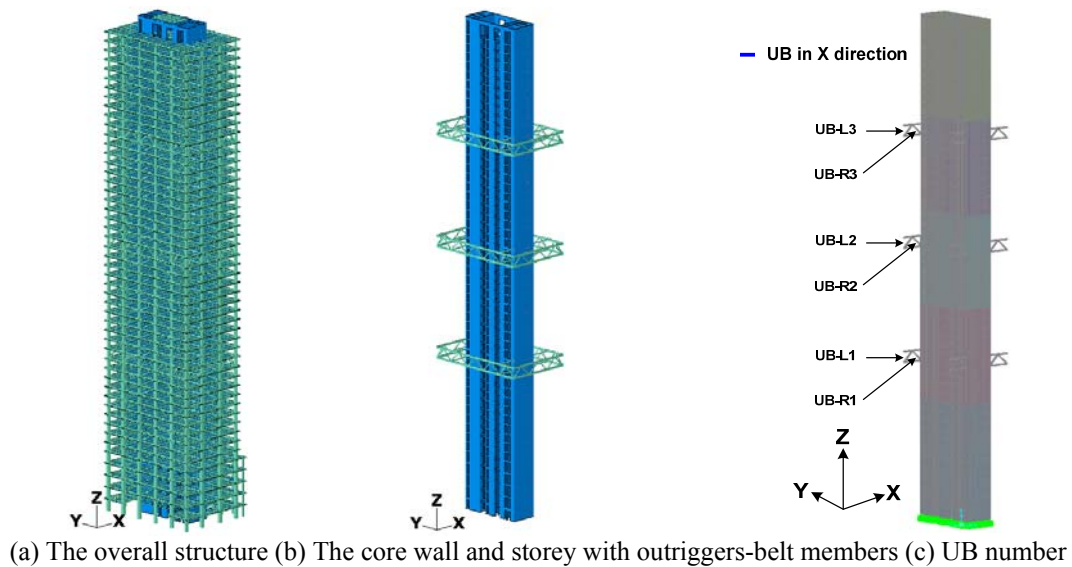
The 3-D finite element model and layout of Unbonded brace
